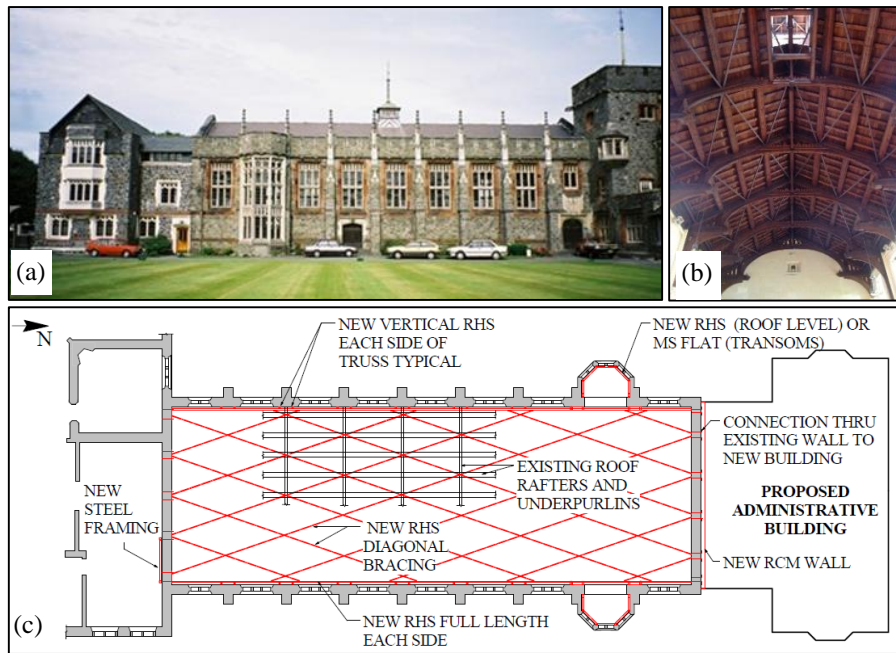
Retrofit of Christ's College Memorial Dining Hall, 33 Rolleston Avenue: (a) Exterior view of west façade. Taken by Melanie Lovell-Smith, NZHPT; (b) Interior view of roof strengthening; (c) Plan.
